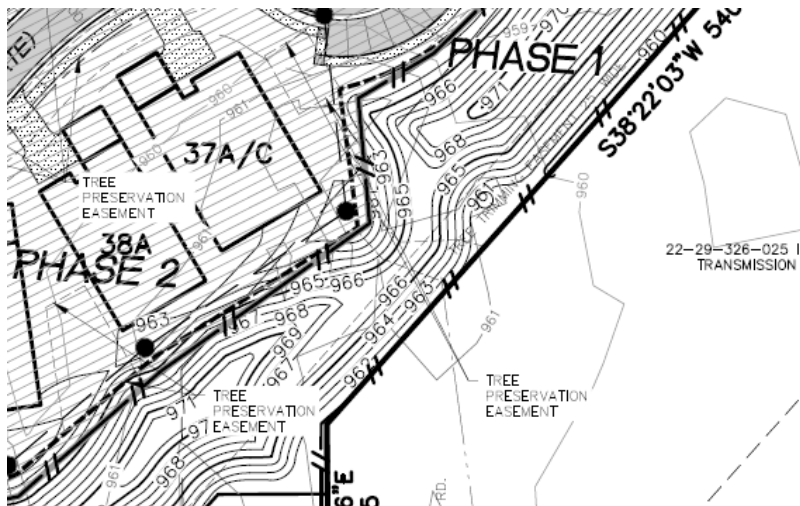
New grading proposed in berm area with removal of sidewalk, June 2022
